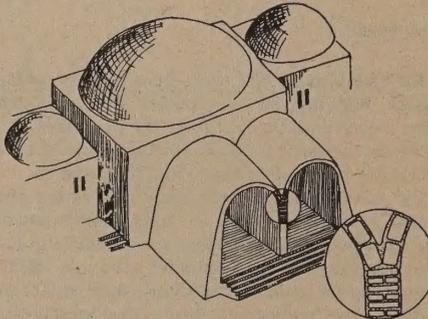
This style of earth dome and vault construction was used in a reconstruction program at New Gourna, Egypt.
